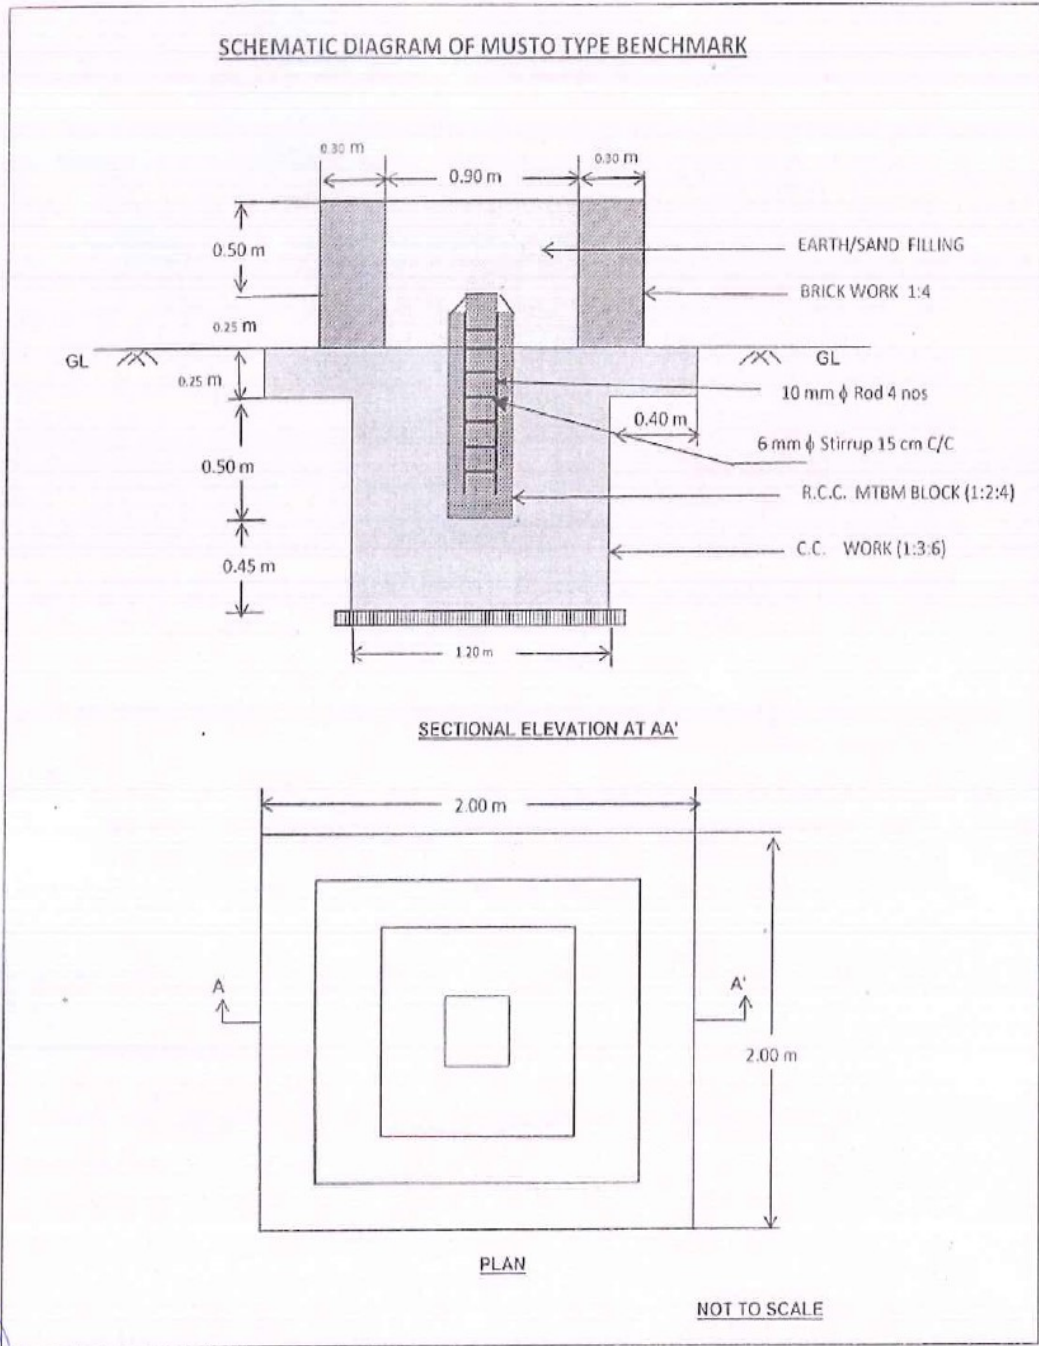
Typical Section of BM Pillar near the RTDAS location
